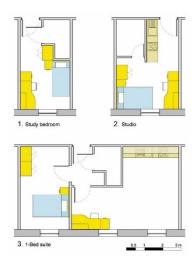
Schematic plans showing typical layout of accommodation rooms in Mayflower halls of residence
